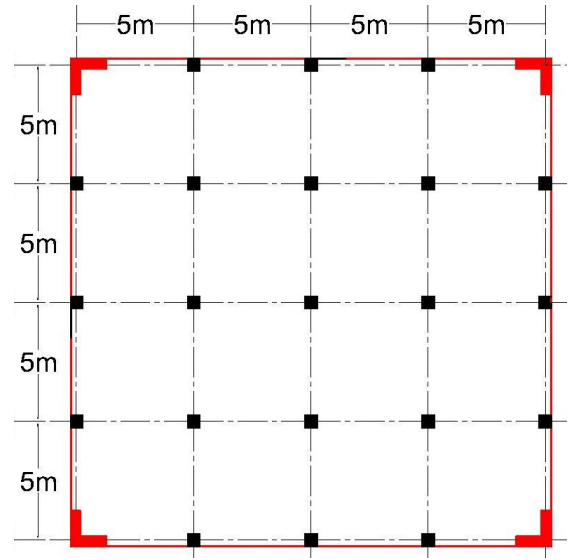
Floor plan of flat slab with edge beam (MRF)
